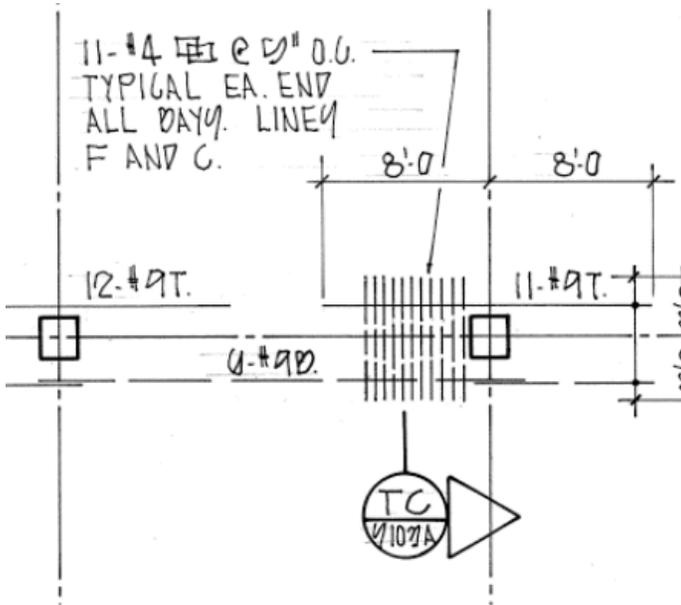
Beam between lines 9 and 10 along C on the 5th floor. Punching shear was checked for this slab around the right column.
